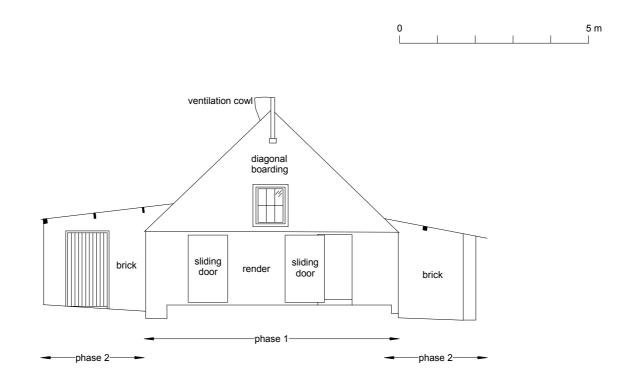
Structure 10, 1898-1918 milking shed south elevation.
